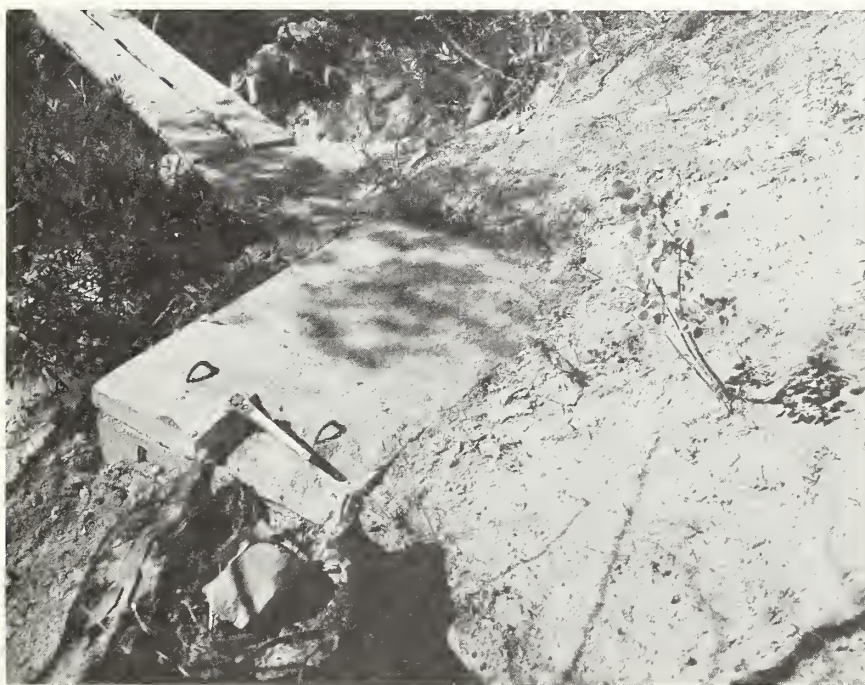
From collection box water enters two-inch drive pipe and travels to ram.
